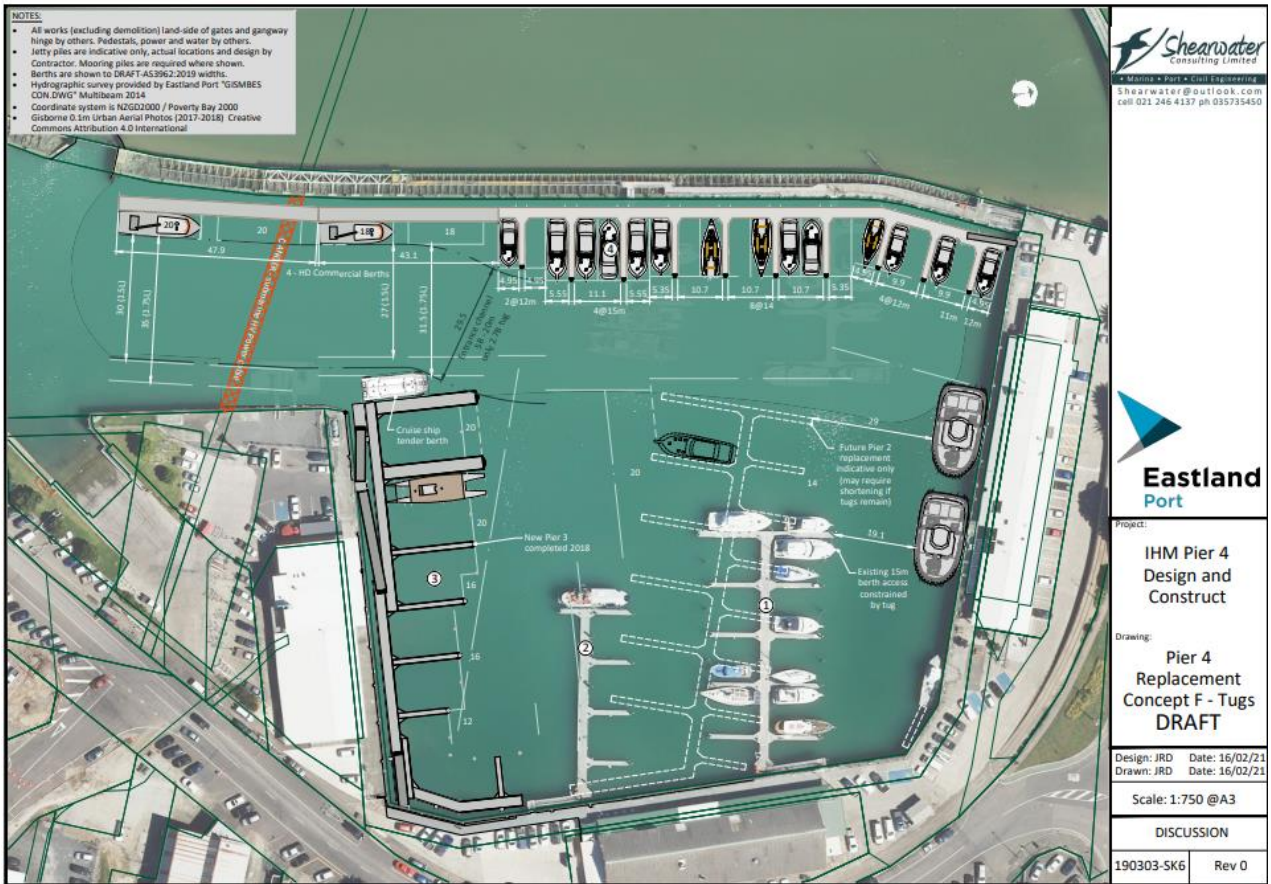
Inner Port Plan of Proposed New Tug Berth and Other Facilities
